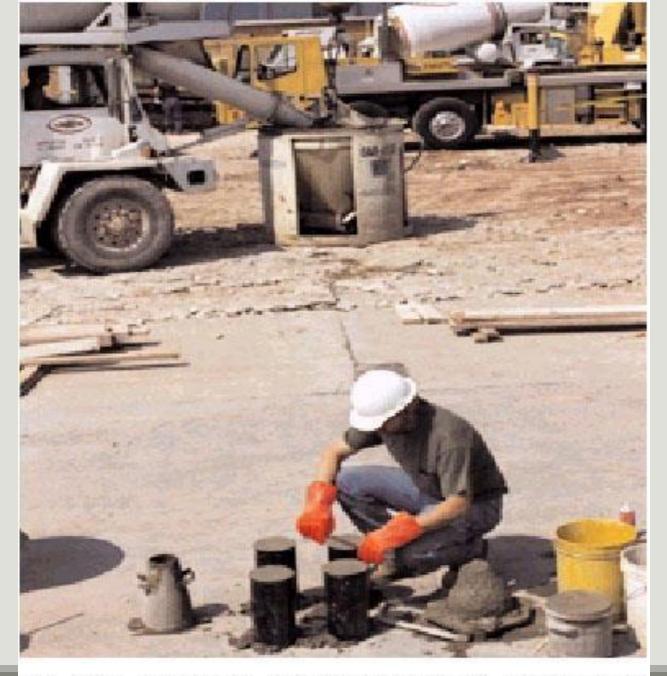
Preparing test specimens for compressive strength of concrete. (69790)
